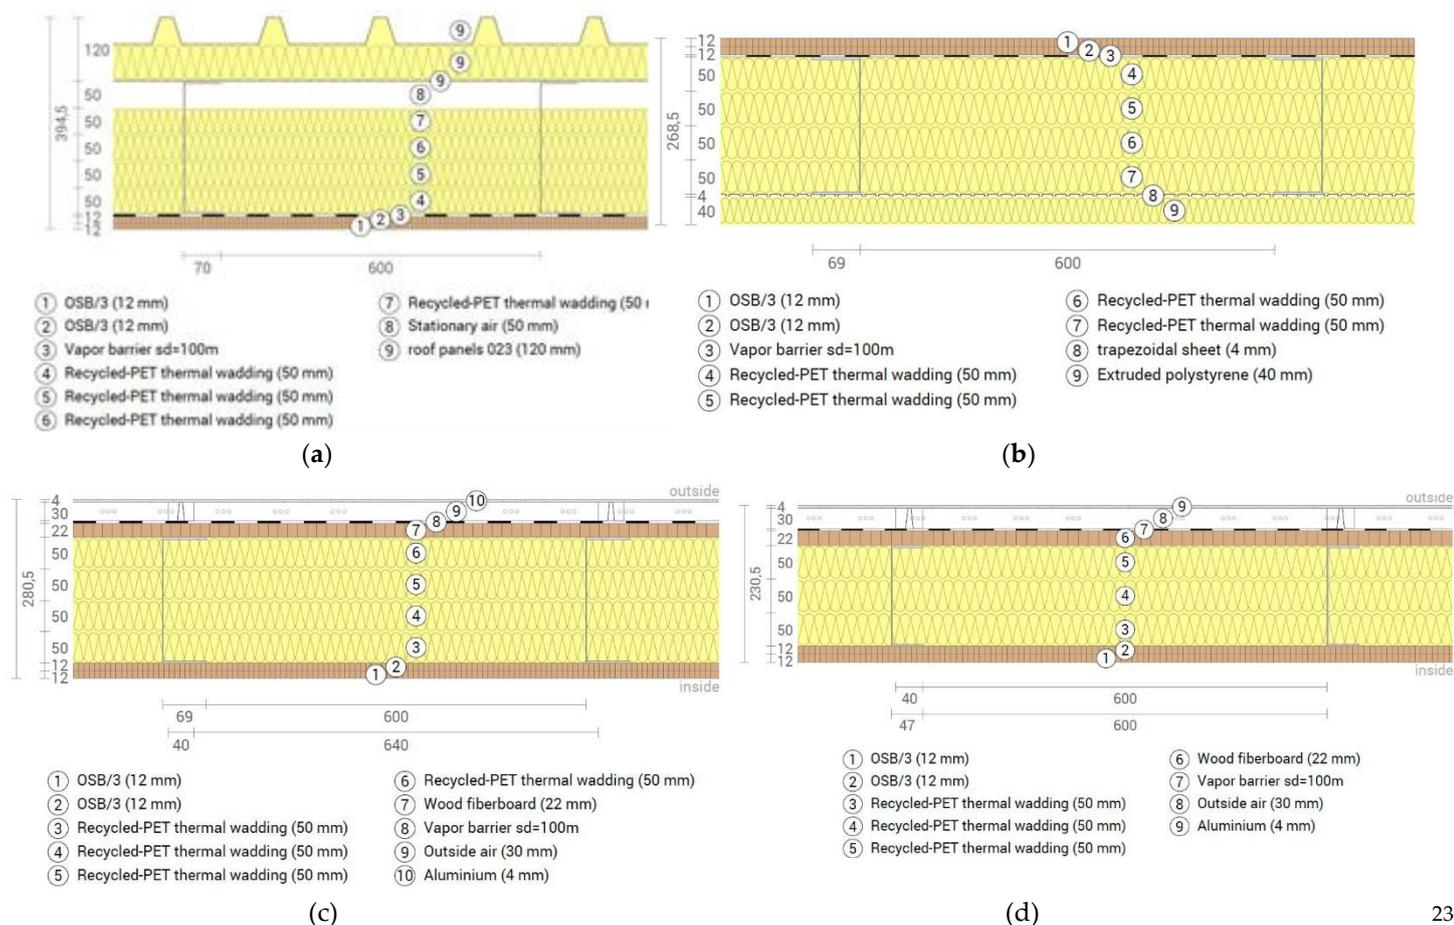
LSF construction elements stratification: (a) Roof; (b) Floor; (c) Northern wall; (d) Eastern and Western wall.
